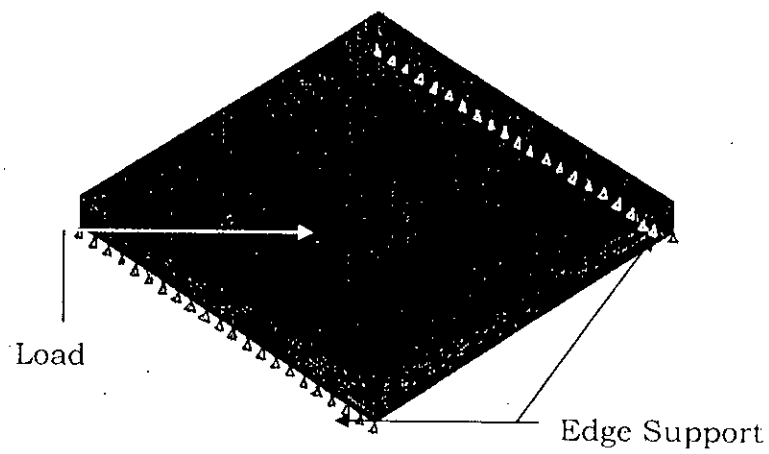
A Test Slab Section of Elstner and Hognestad (1956)
